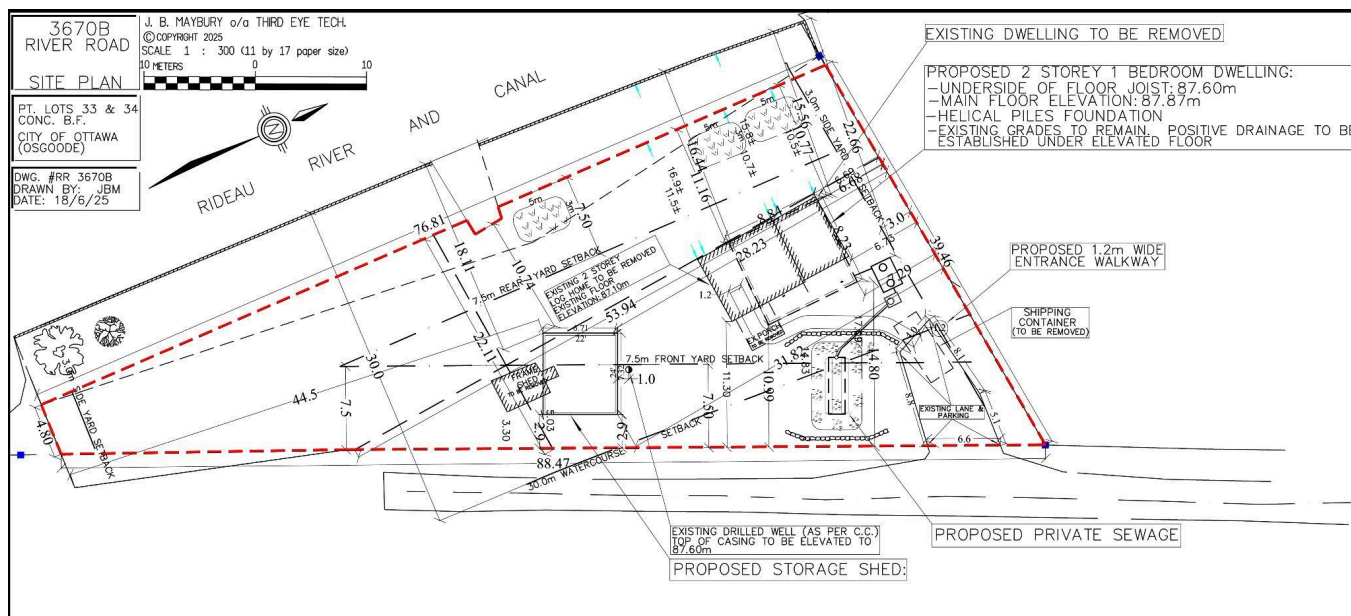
Site plan, dated June 18th, 2025, by Third Eye Technical Service.
